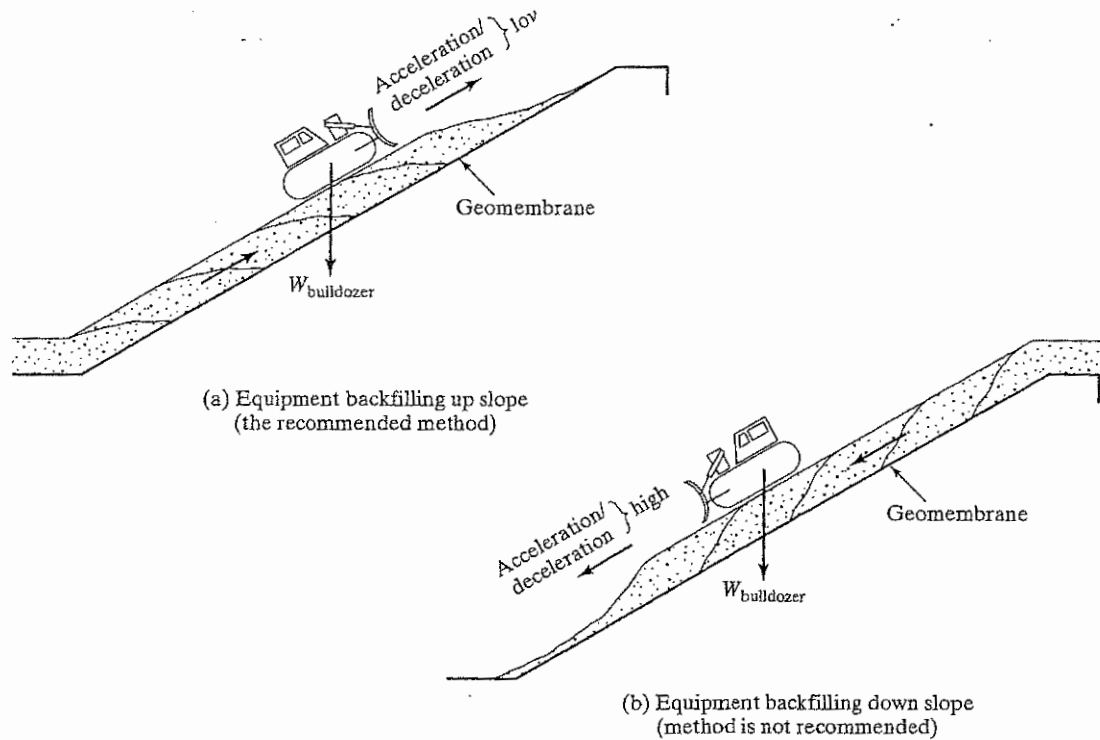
Construction Equipment Placing Cover Soil on Slopes Containing Geosynthetics
